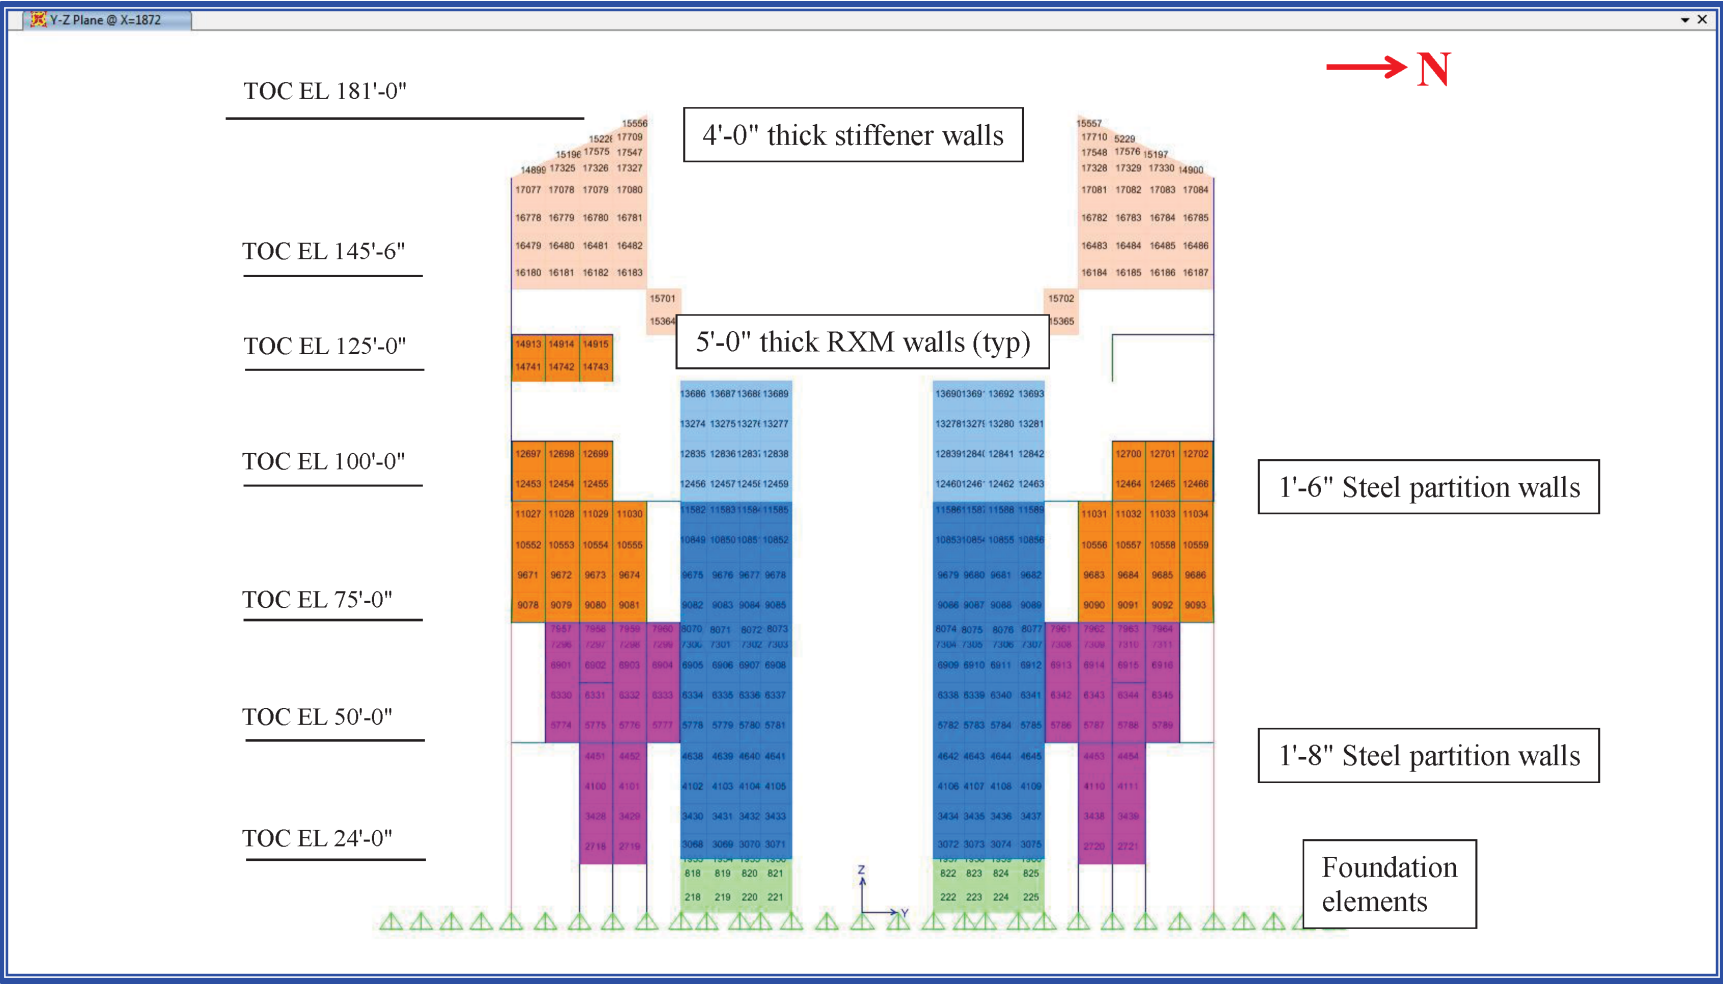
B-15: RXB Reinforcement Elevation at Grid Line 4 Wall
